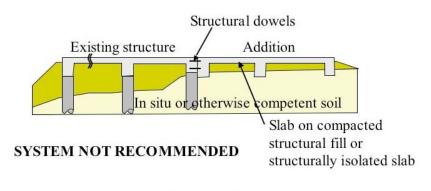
Mixed Depth System for Building Addition with Shallow Foundations
